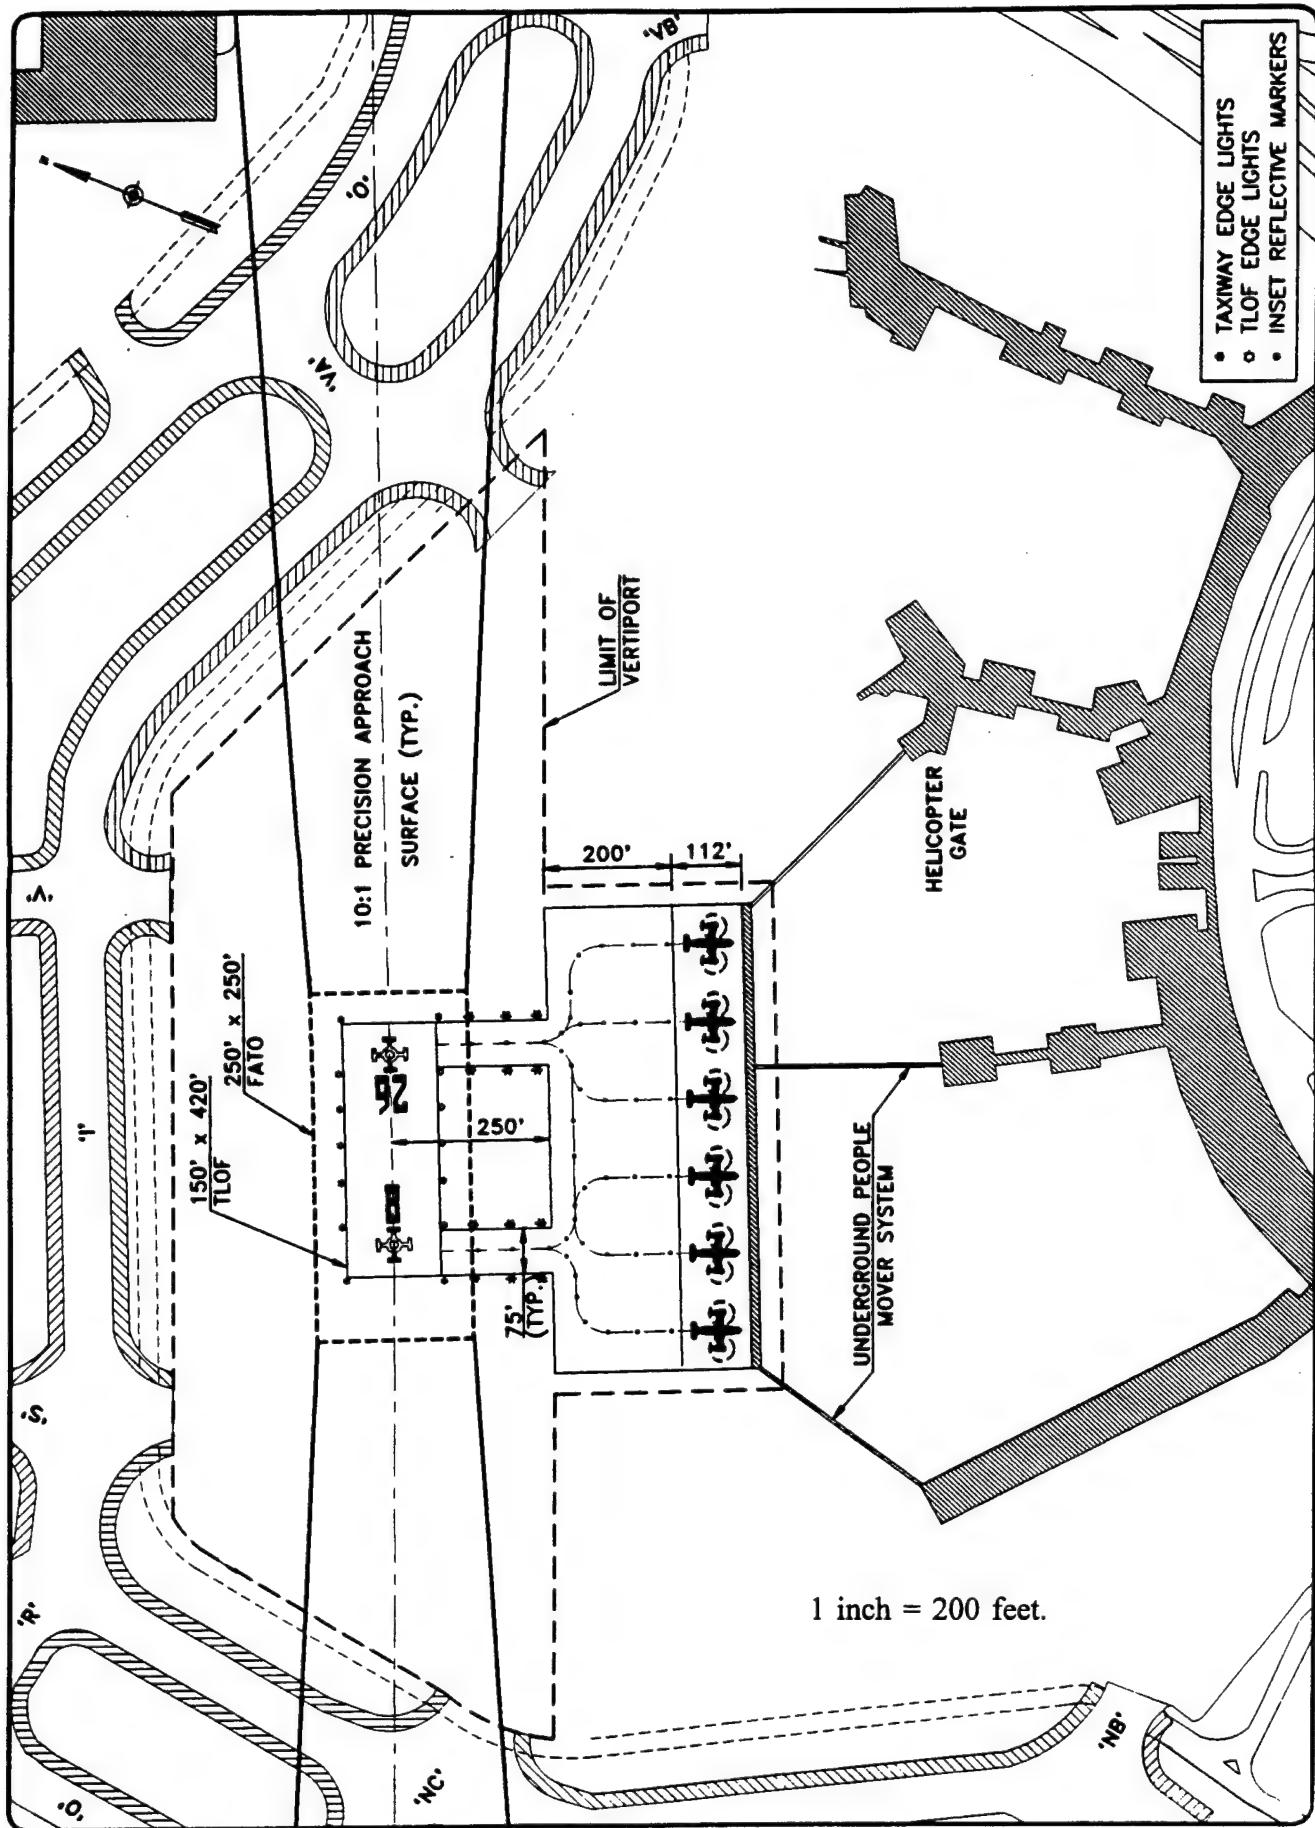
SITE PLAN - JFK INTERNATIONAL AIRPORT, NEW YORK
